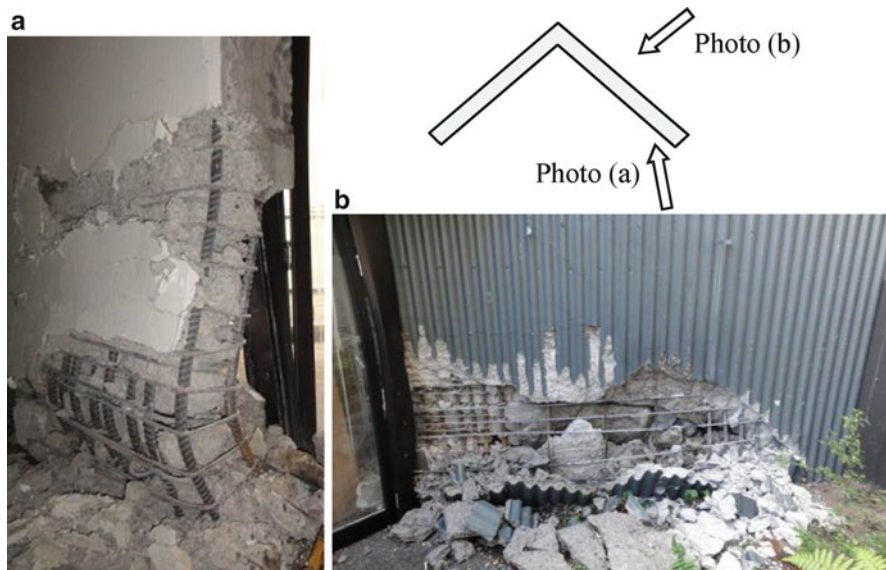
Seven-storey 1980s building with compression failure of the V-shaped RC shear wall
